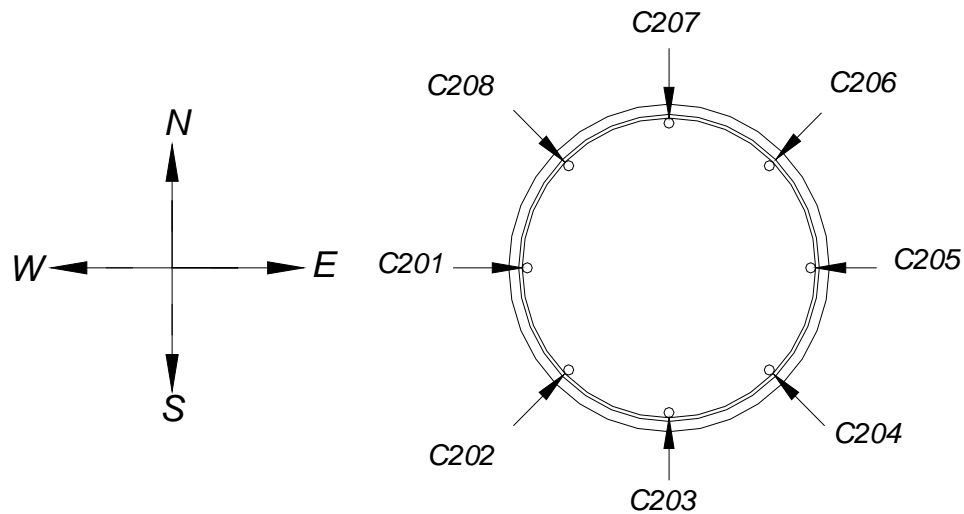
Cross section of TS-2 showing the reference numbers of the eight #5 stainless steel longitudinal rebar.
